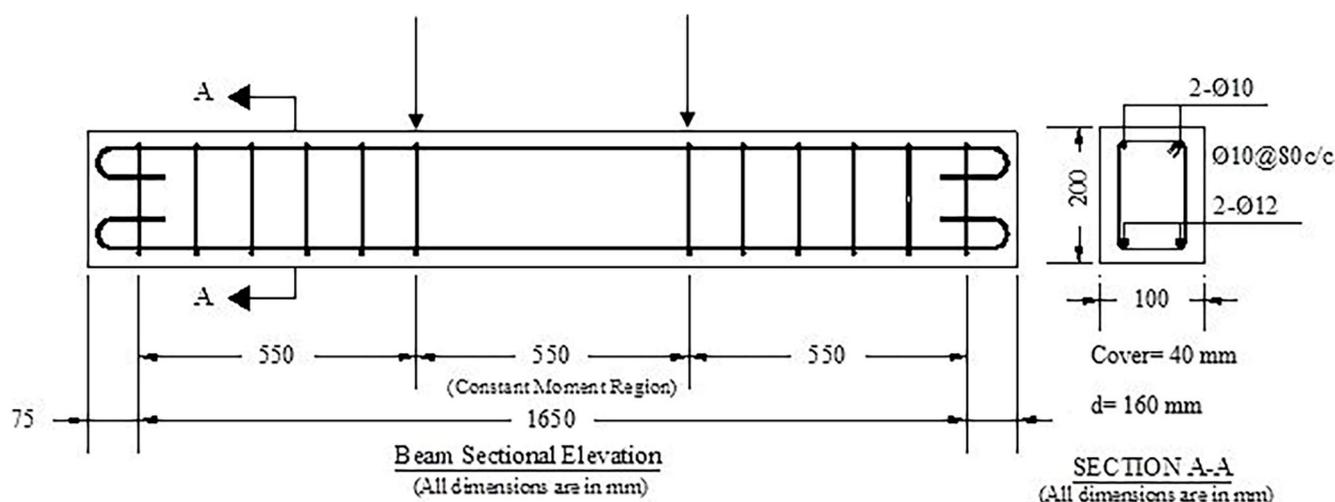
Reinforcement Detail of All Beams for Flexural Mode of Failure.
